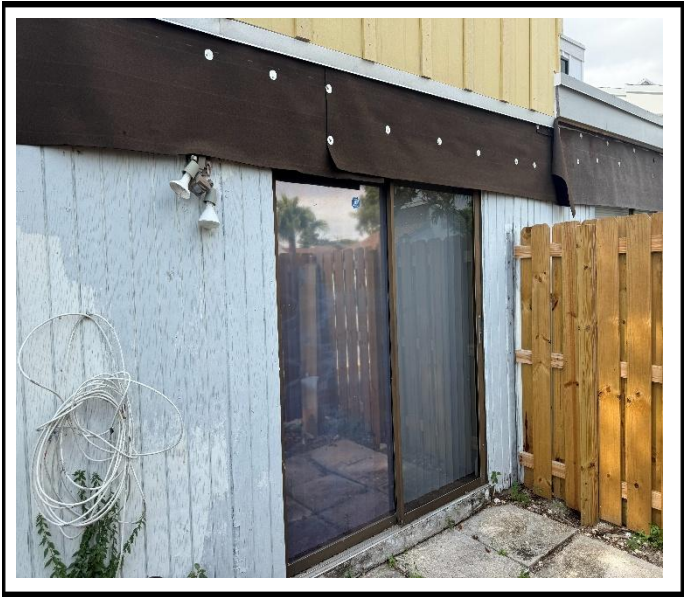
Existing non-impact-rated Sliding Glass Door frame
